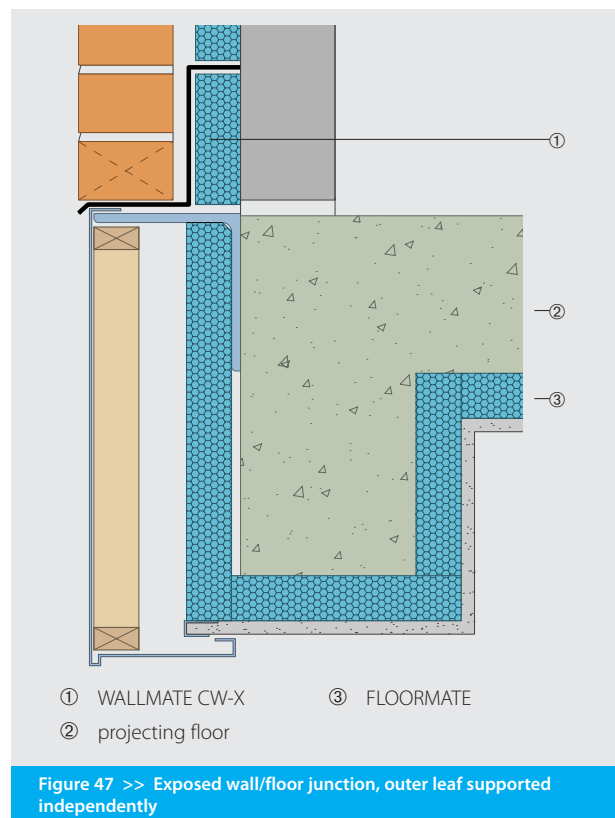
>> Exposed wall/floor junction, outer leaf supported independently
